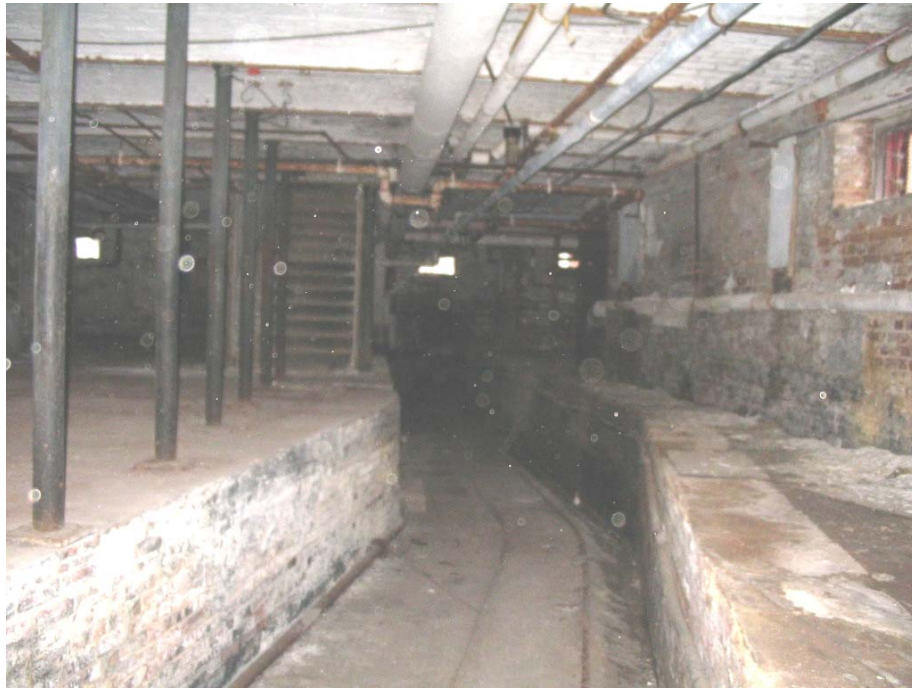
General view looking west toward east portal in basement of Building 31, Atkins Hall
